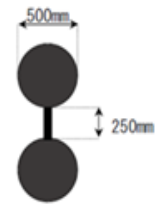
14 : Arrangement of Light-Beacon at the Construction Area
